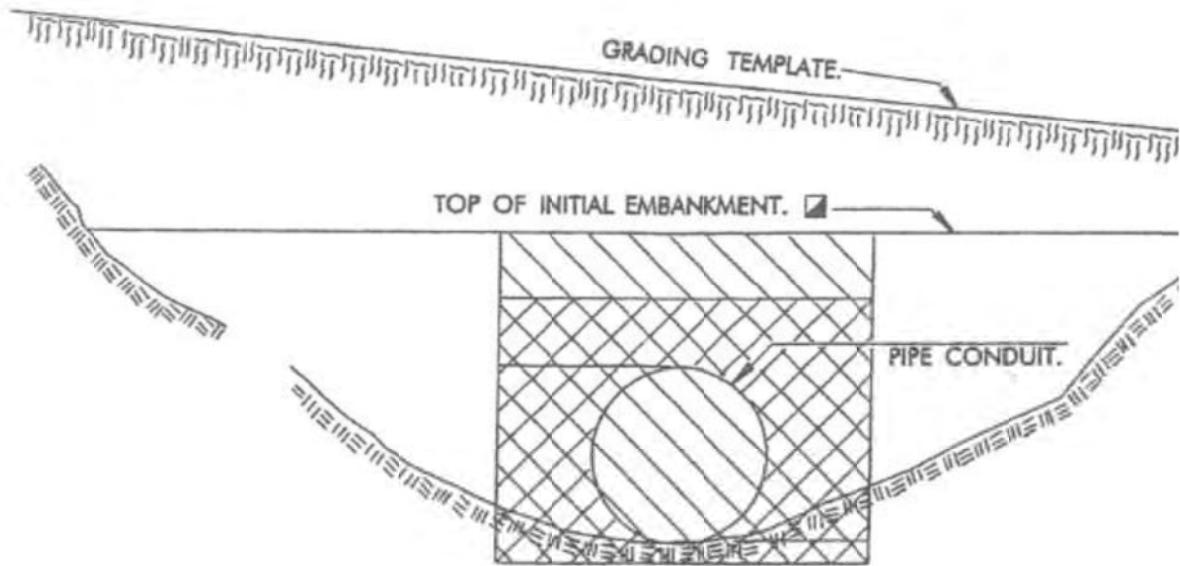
ODOT pipe installation standard SPI-3 detail. Discussion and Problem Model
